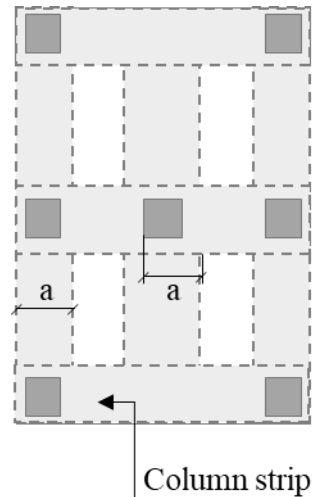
Proposed zone scheme on the floor surface with internal column strip
